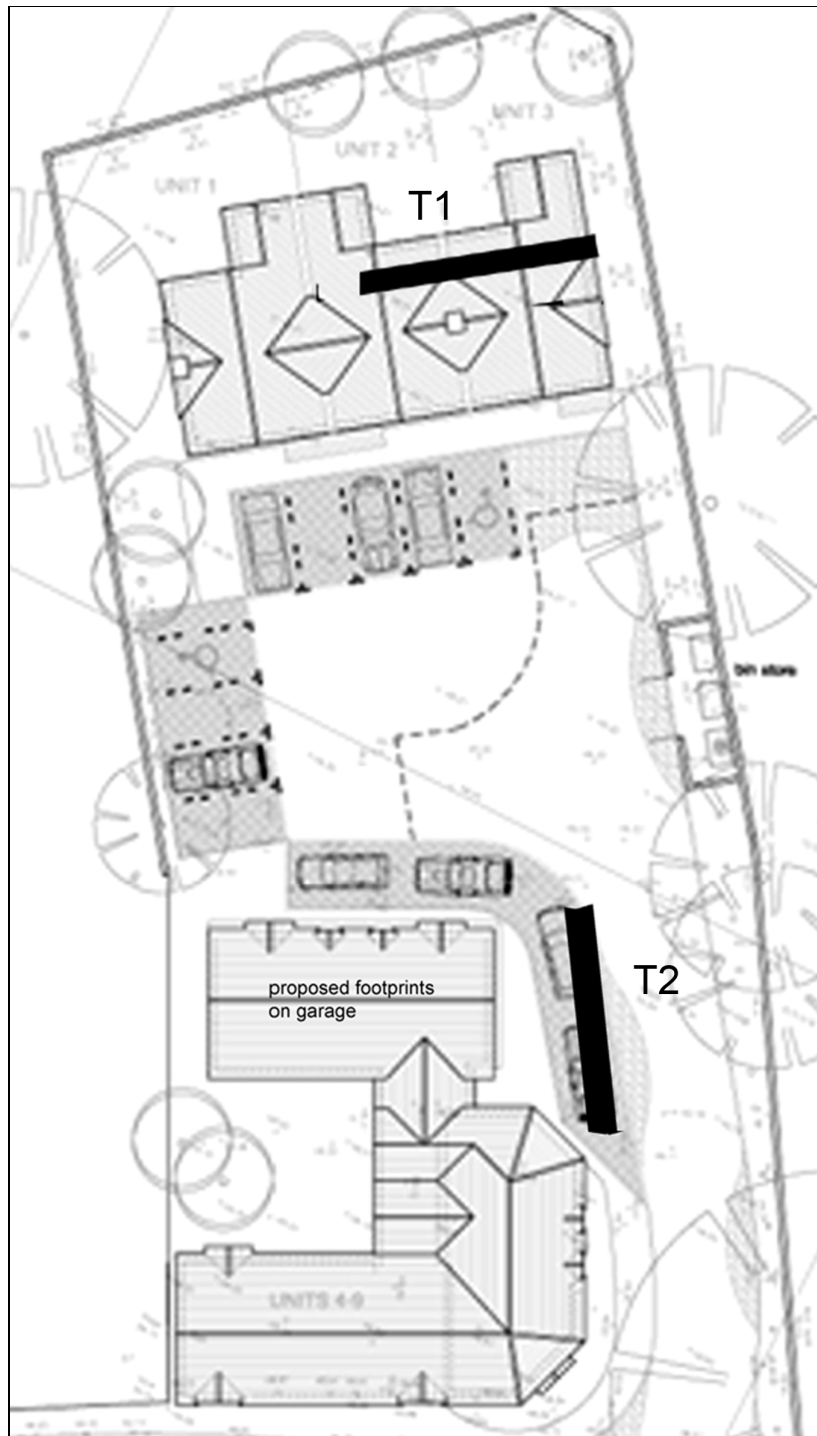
Proposed Development showing trench locations (Scale 1:300)
